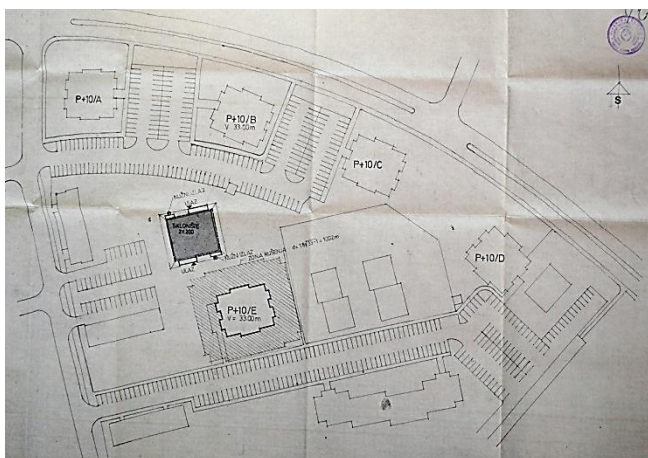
Site plan of the fallout shelter Ruder Bošković [15]. The plan of the shelters is committed to their primary function. Shelters of the residential building are connected to the central room of the central shelter from which it is possible to access smaller accommodation rooms, sanitary facilities, water tanks, storages, etc. (Fig. 5).
